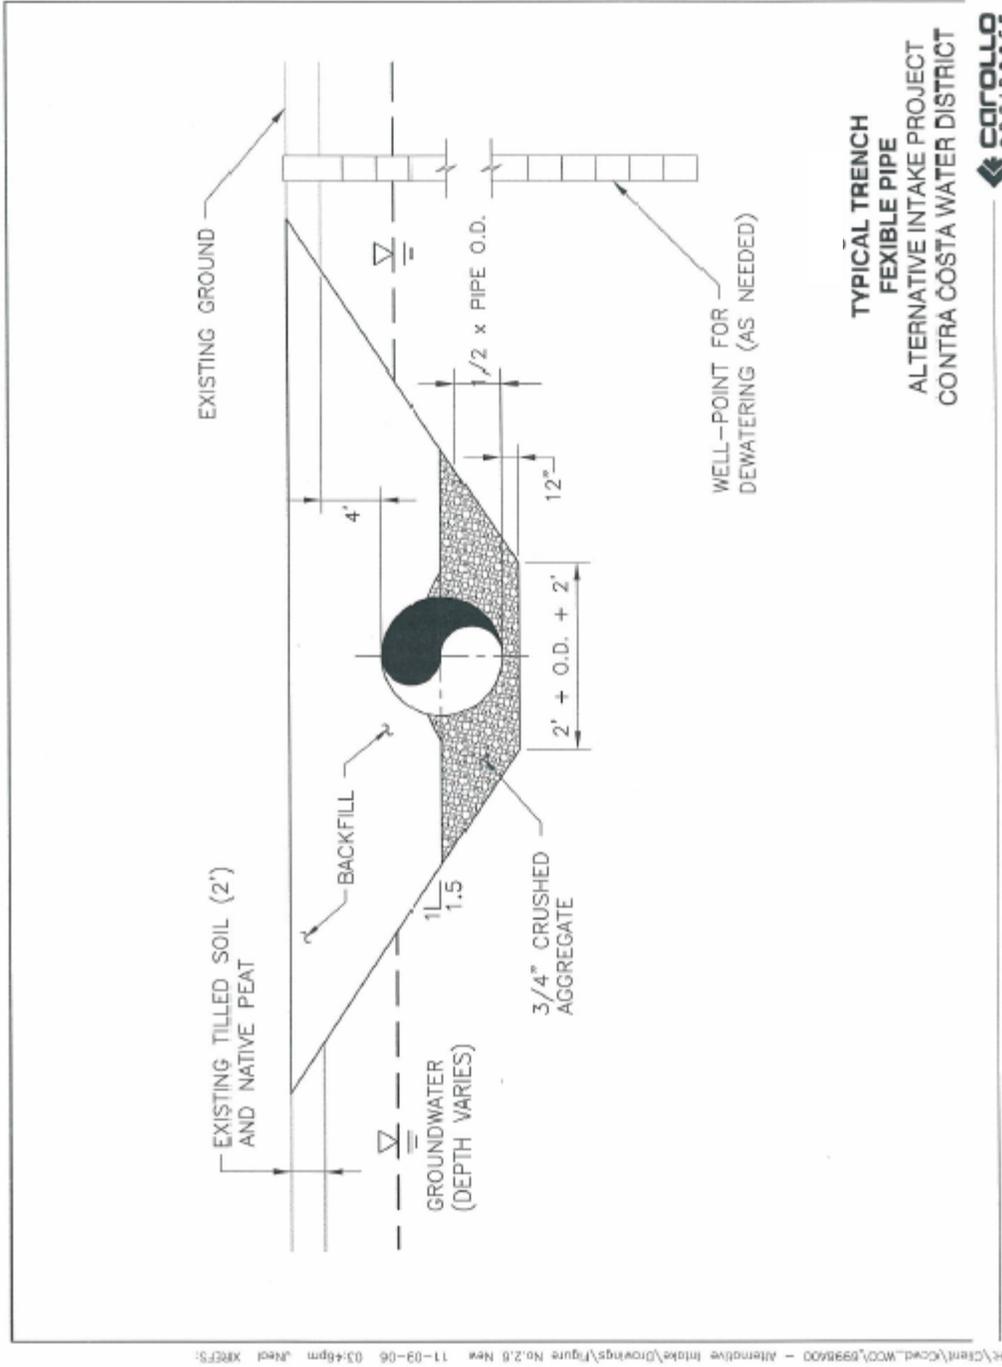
Typical Open Trench Design for Pipeline Construction
